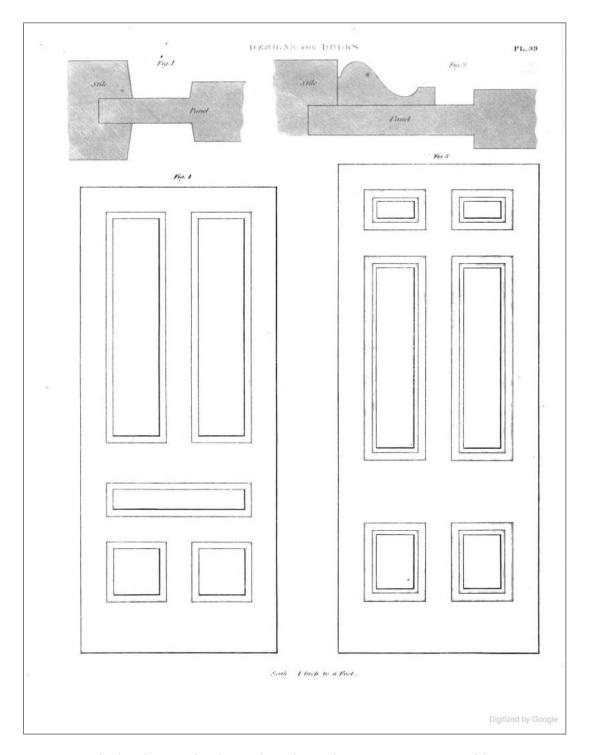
Typical Asher Benjamin Design Plate, Plate 39, *American Builder's Companion*. Detail similar to that of Braintree Hill Meetinghouse paneled doors.
